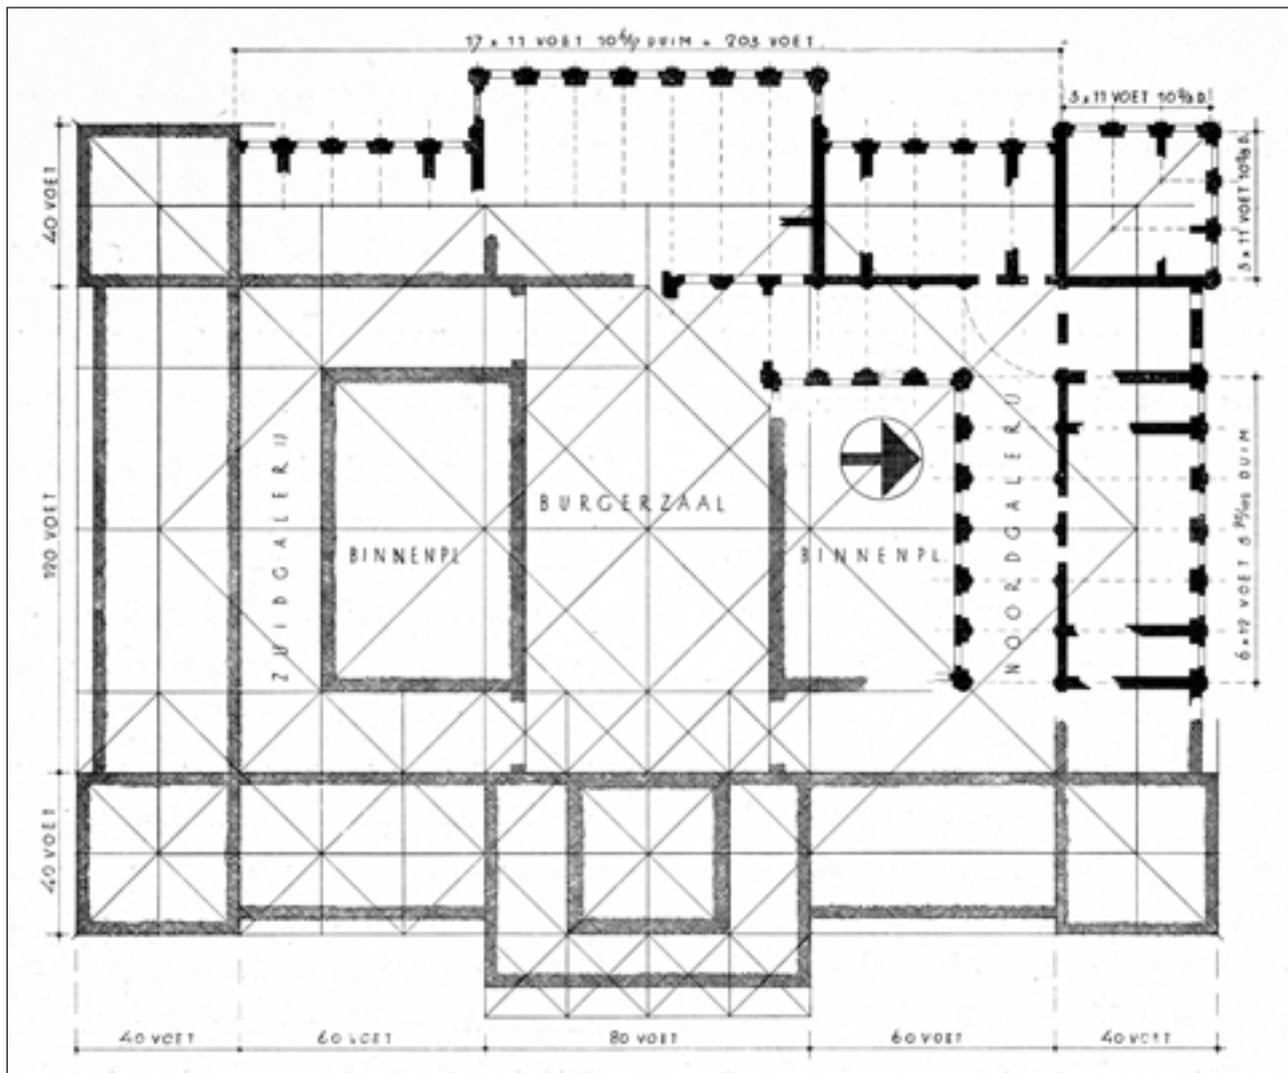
Reconstruction of the grid system of the ground plan of the Amsterdam Town Hall and its division into bays (Wegener Sleeswijk 1940).
